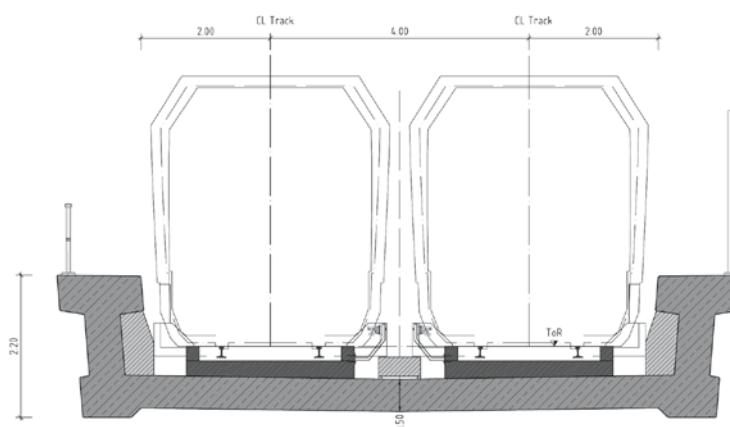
, Selected trough cross section for the elevated track of Doha Metro
